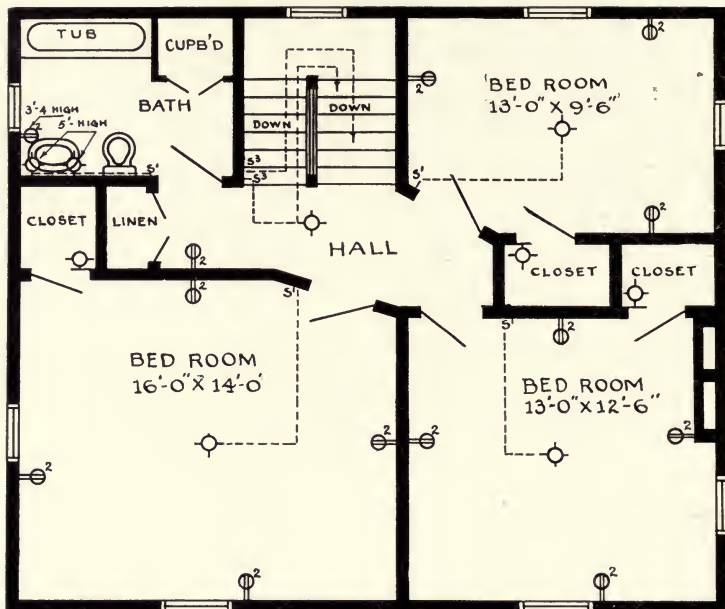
A.—Wiring layout suggested for the procurement of electrical comfort and convenience. Typical second-floor plan.
